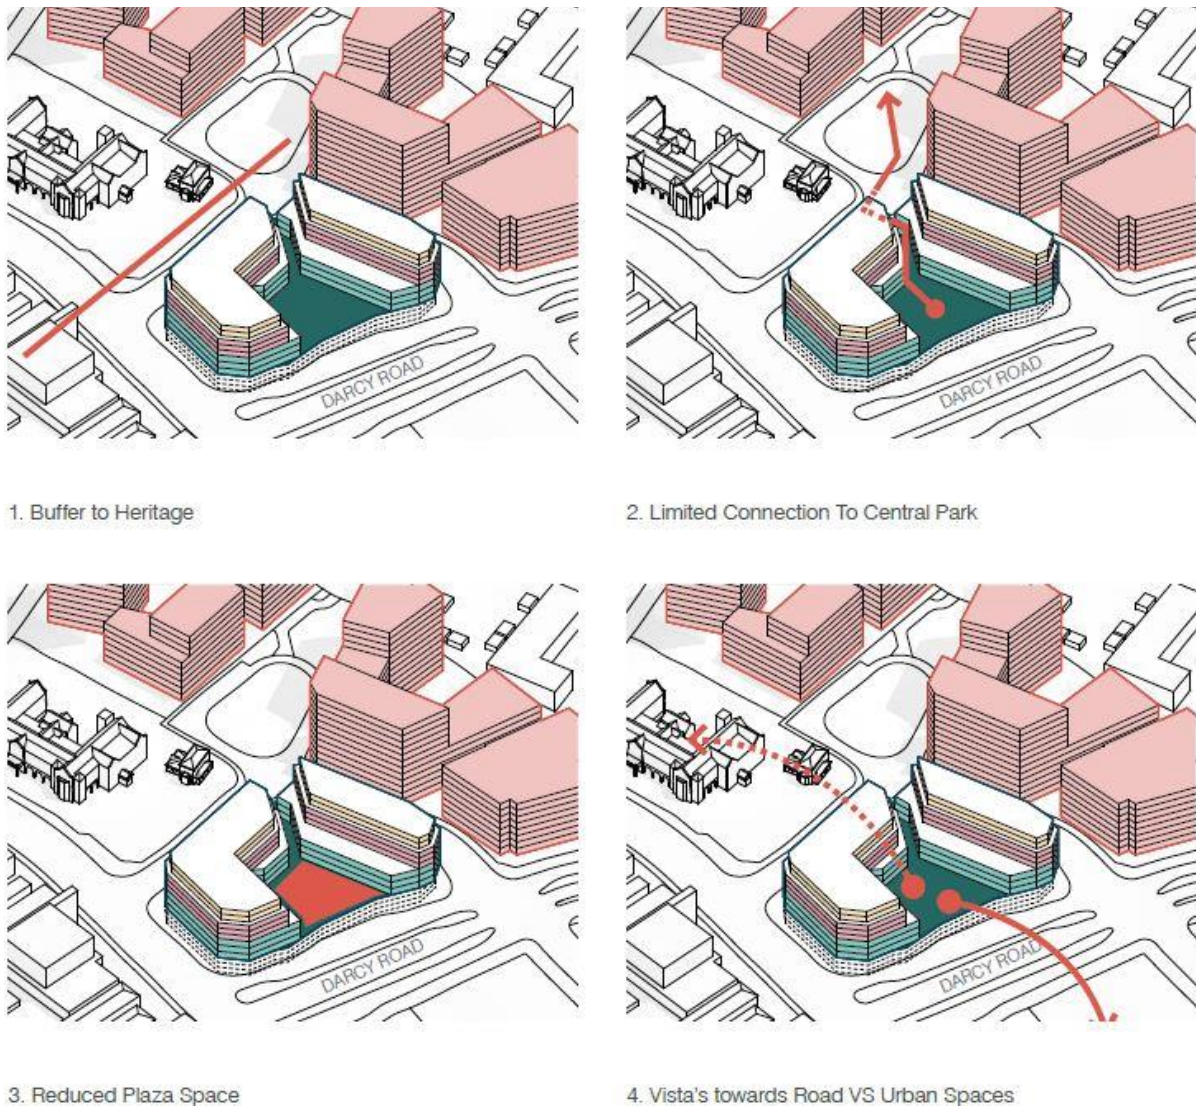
Design critique of the approved building envelopes on Lot 2 under DA/571/2014
